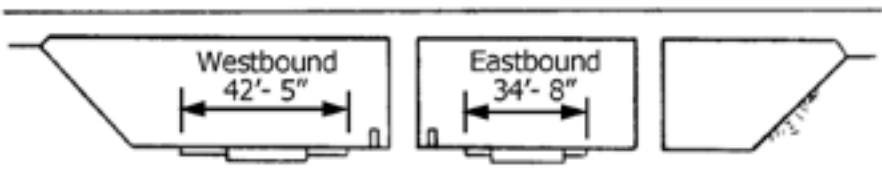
Bridge elevation view of horizontal clearances for highway feature carrying mainline and ramp traffic below the bridge.
